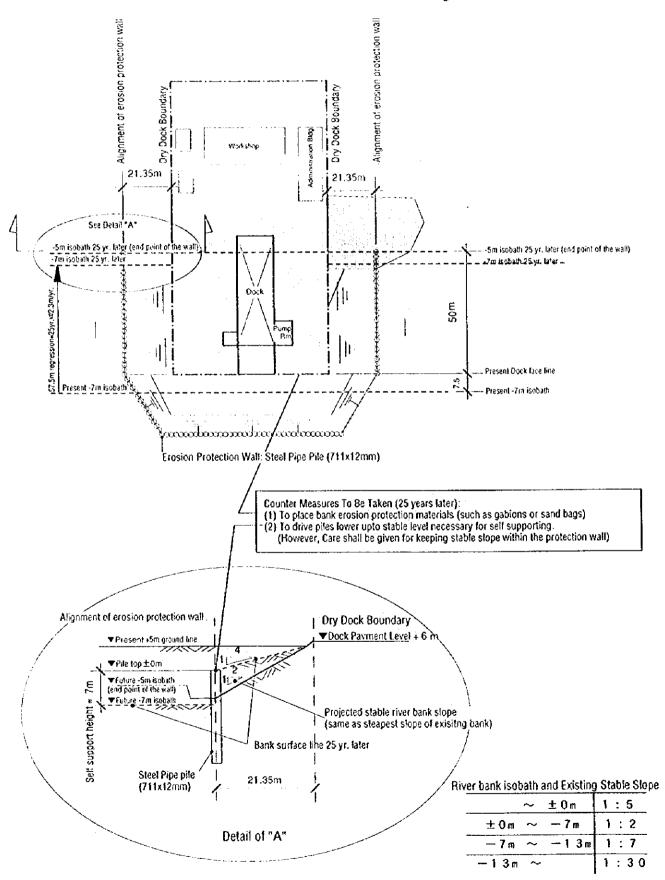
Projected Local Scouring Areas Due To Plan Facility
